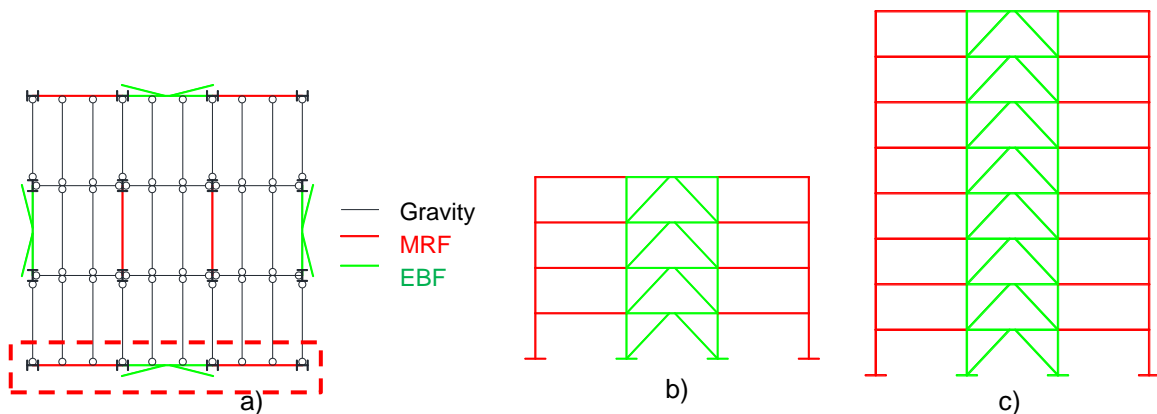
Structures description: a) plane configuration, b) 4-story frame elevation and c) 8-story frame elevation.
